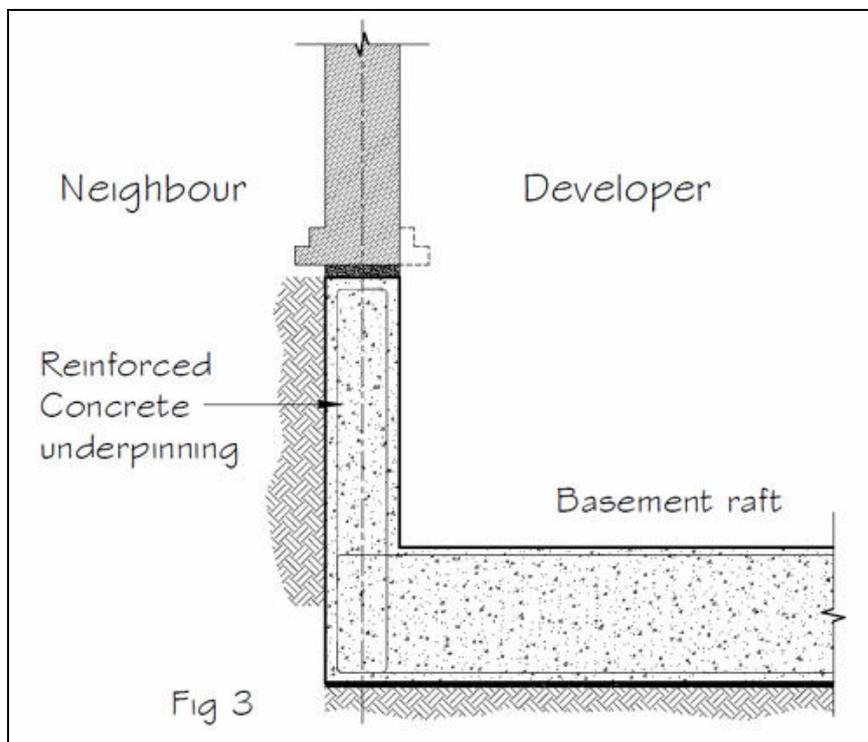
2000's: To save space and improve watertightness, reinforced underpinning is integral with the Building Owner's raft foundation, sometimes piles, swimming pool, lift pit etc.
